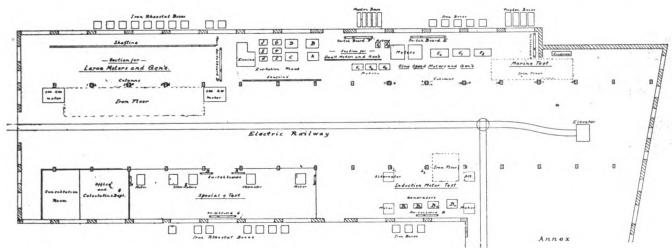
PLAN SHOWING ARRANGEMENT OF TESTING BUILDING, GENERAL ELECTRIC COMPANY, SCHENECTADY.
